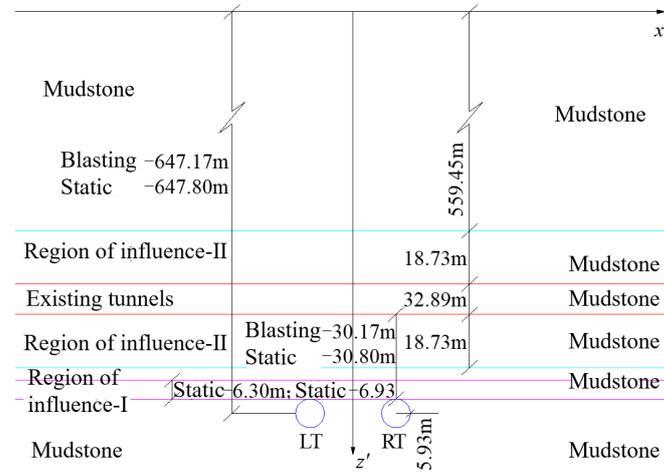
Stratigraphy of the rock layers taking into account the effect of the stiffness of the existing tunnel and the static and dynamic loads of the cross-tunneling project.
